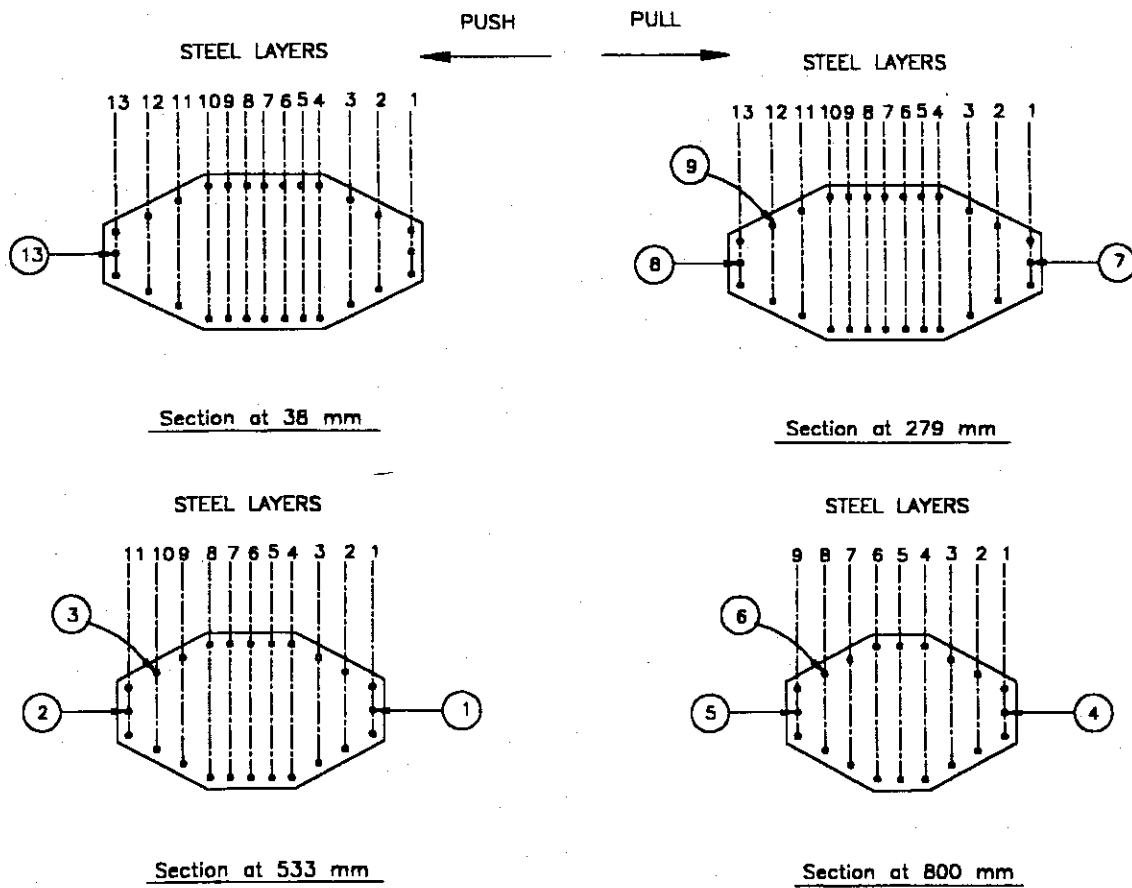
Strain Gages on Longitudinal Reinforcement of Specimen FR
